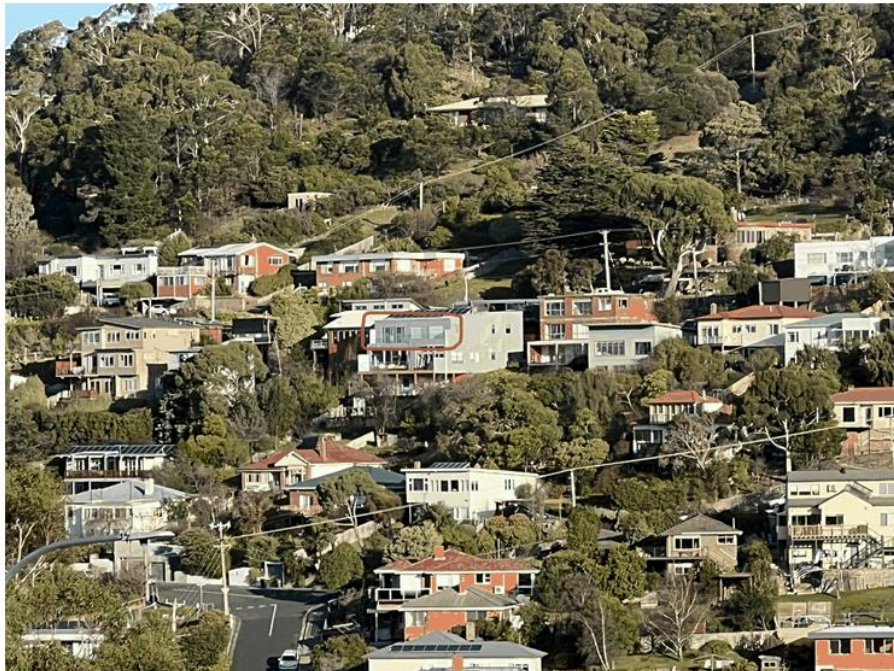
Distant view of the site from Stevens Farm Drive. The area of the proposed extension at the rear of the dwelling has been outlined in red (Source: Planner's photo).
